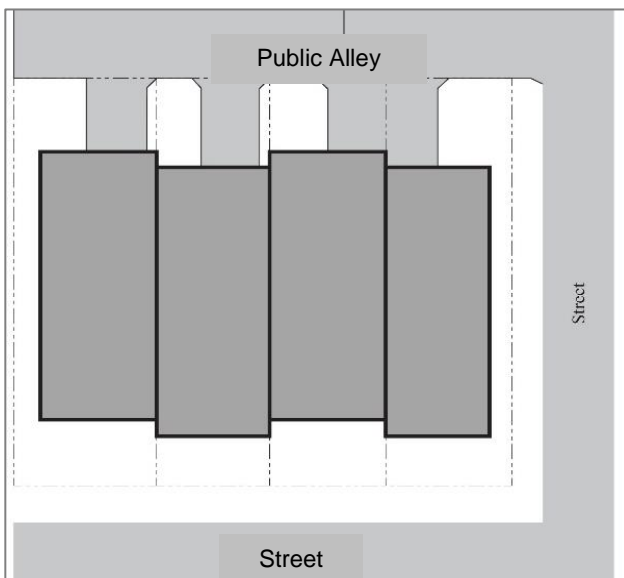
Townhouses with Consolidated Access (thru Planned Development)
